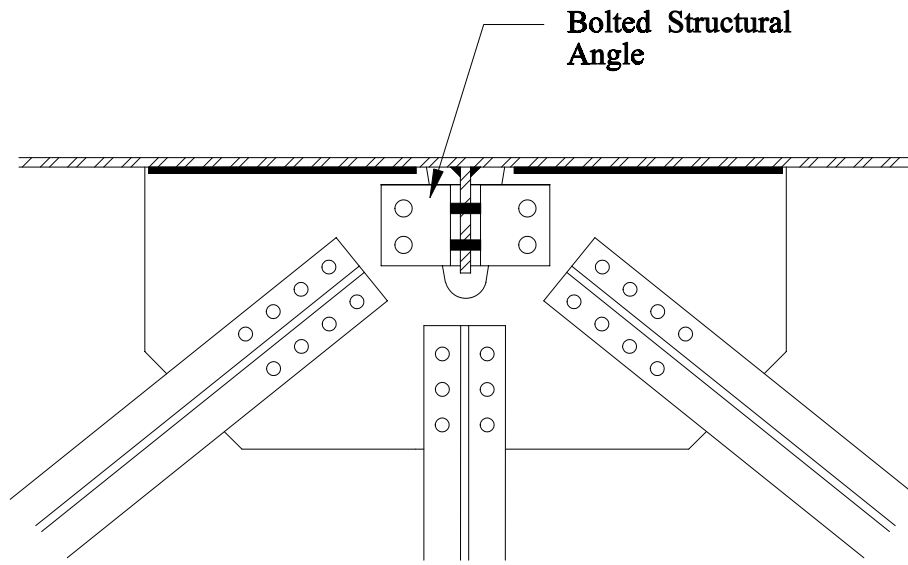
Bolted repair at intersection of gusset plate and connection plate detail.
